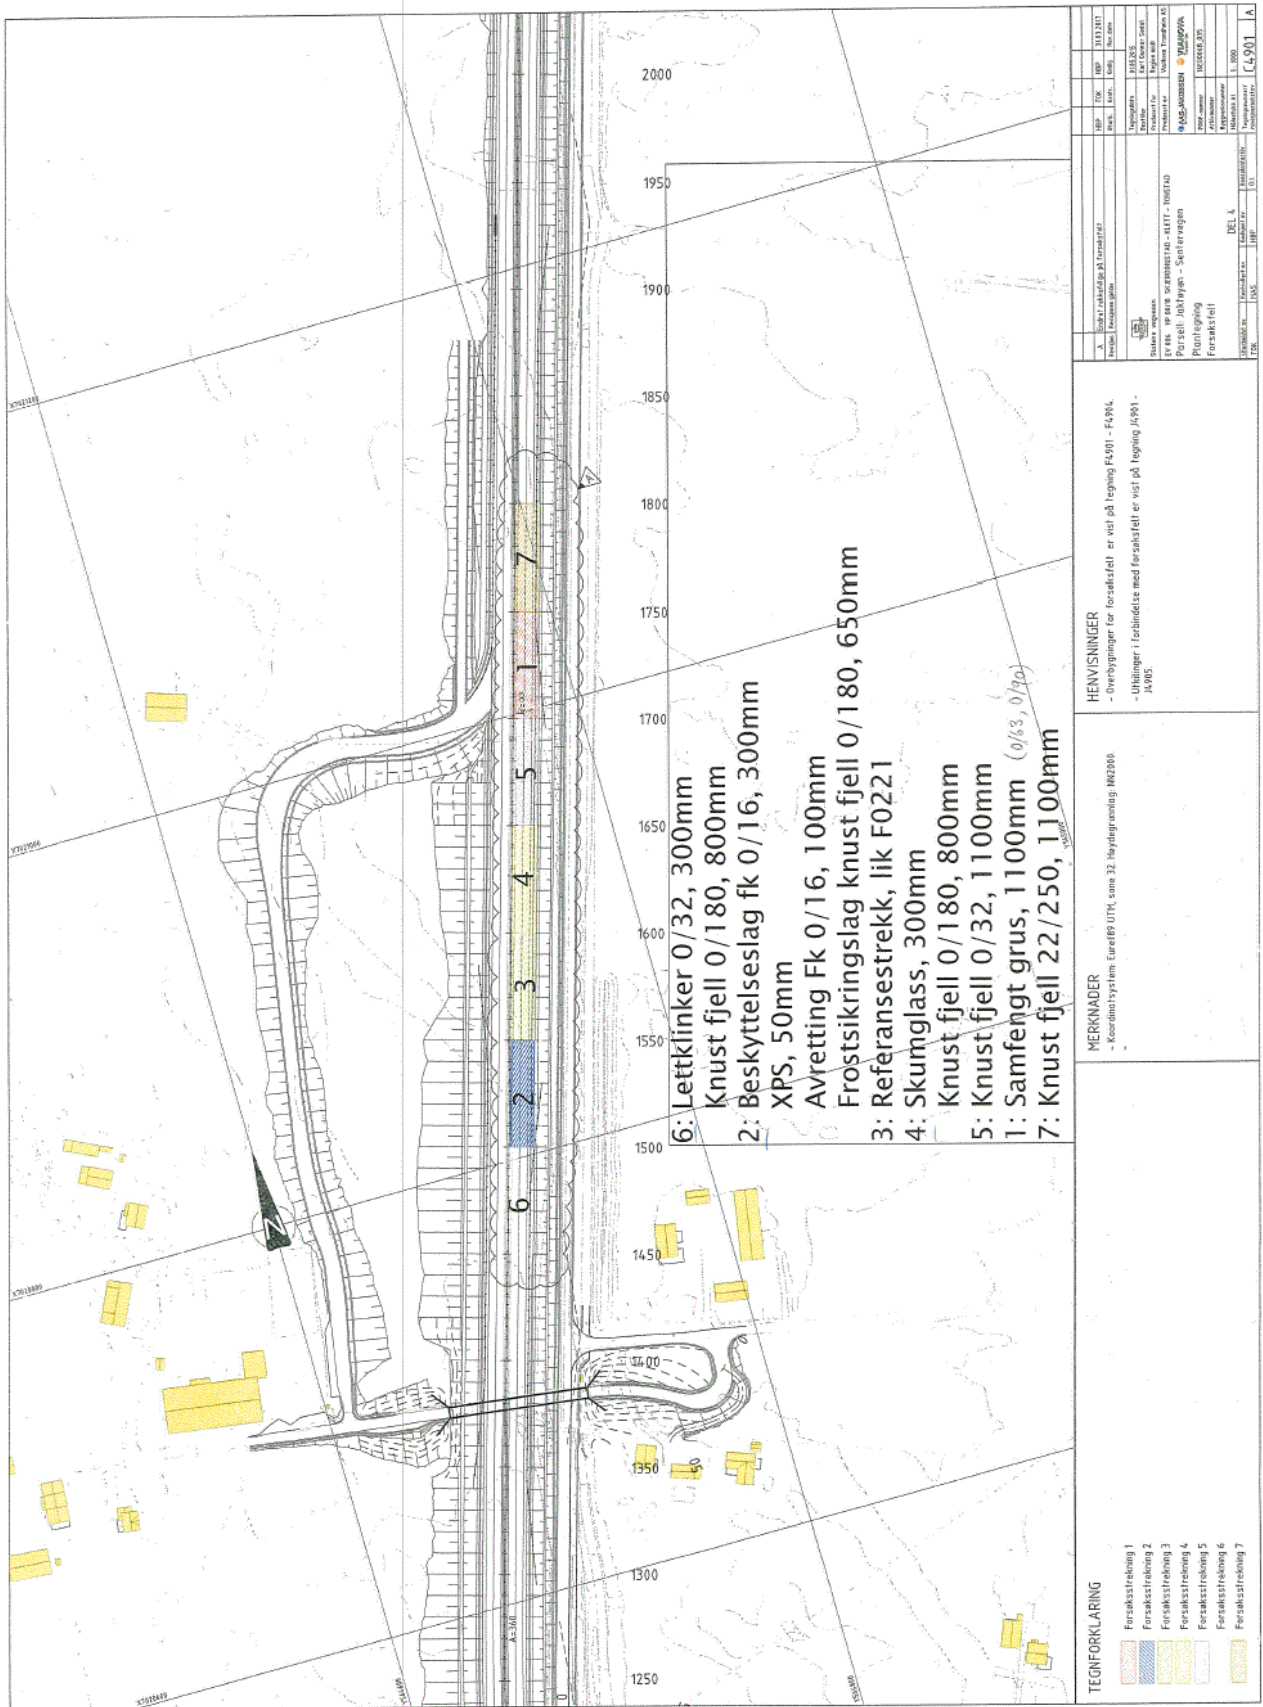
Floor plan over section F1-F7 at Jaktøyen
